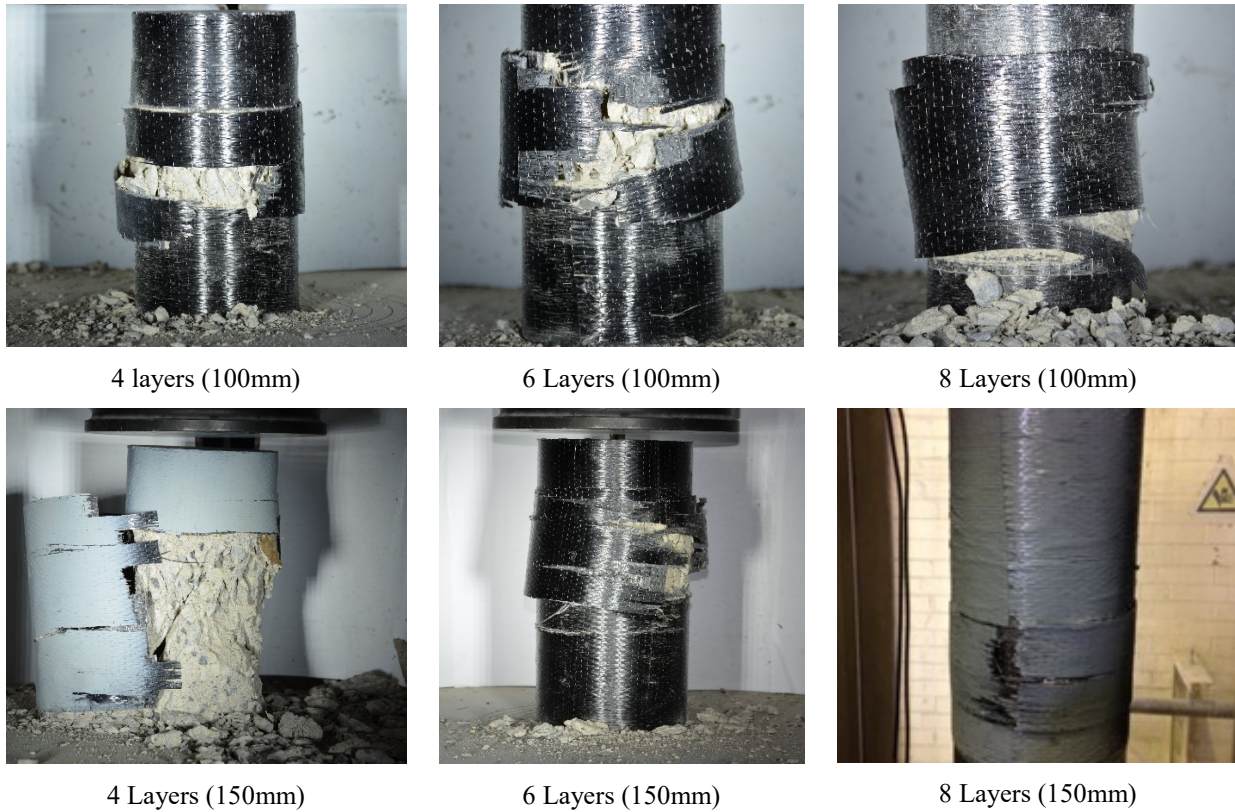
Final failure modes of CFRP confined concrete cylinders (Series 6)
